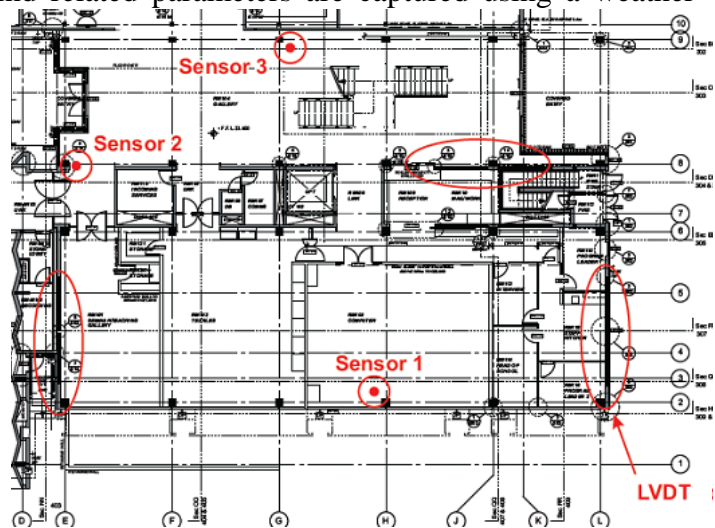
Accelerometers placed in ground floor of the building. (Base plan by Irving Smith Jack)
